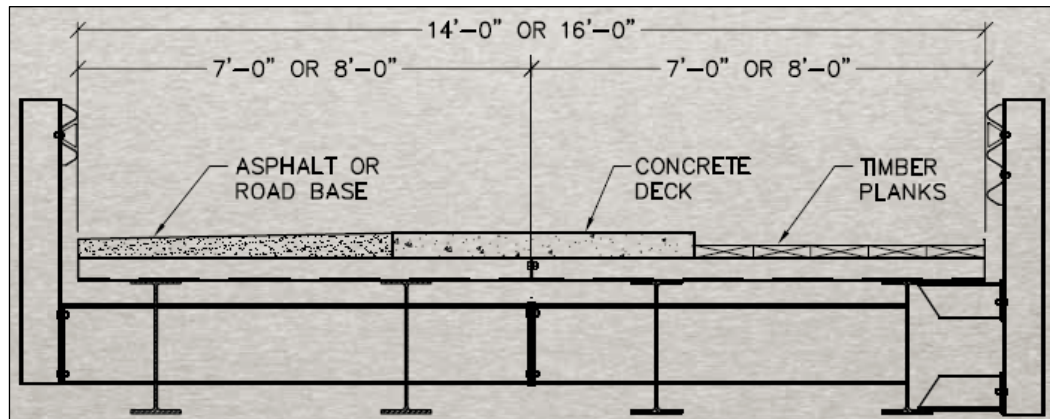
Cross-section of prefabricated modular steel vehicle bridge (Courtesy of Big R Bridge)
